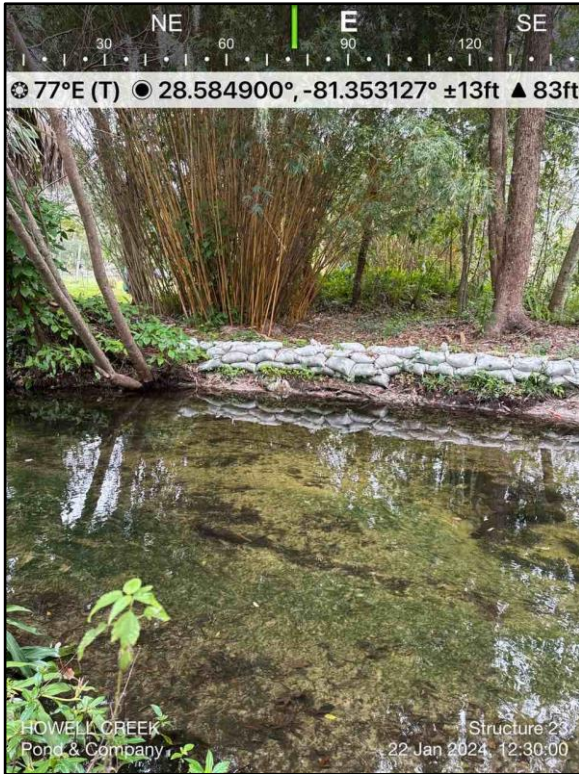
Structure 22; Concrete Wall/Capped Retaining Wall (Priority 4)
